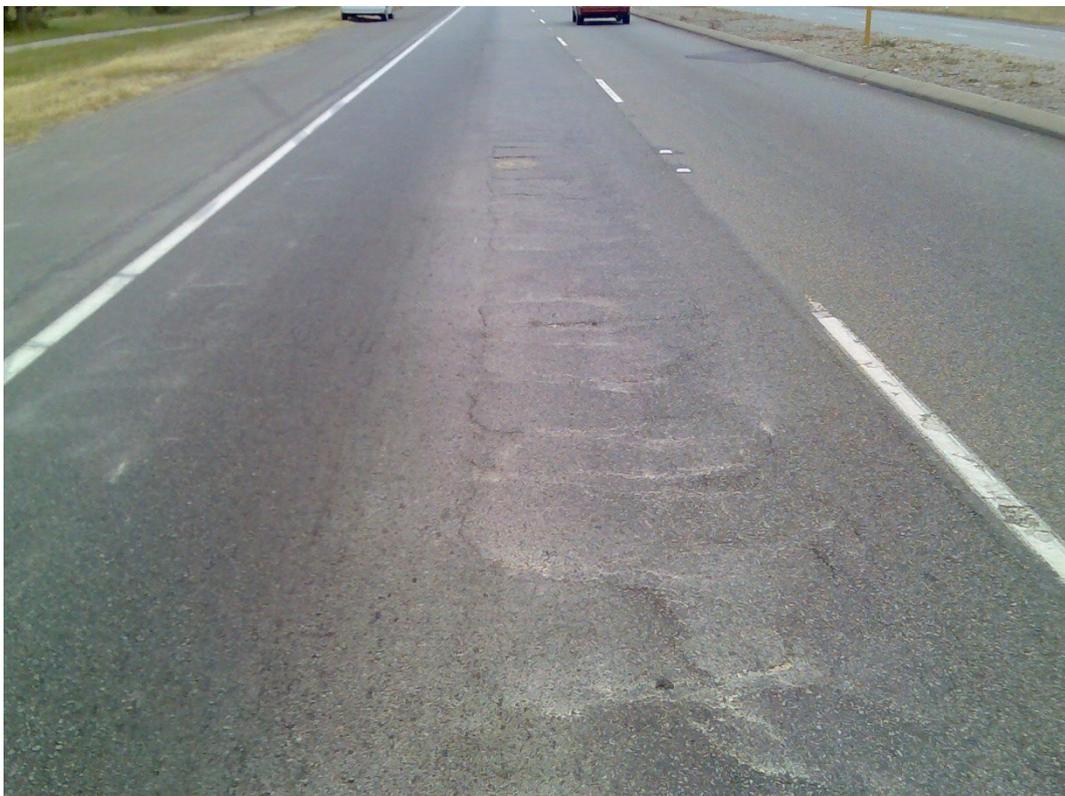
Block cracking of stabilised basecourse reflecting through to asphalt surface on Tonkin Highway approaching Gosnells Road West.
